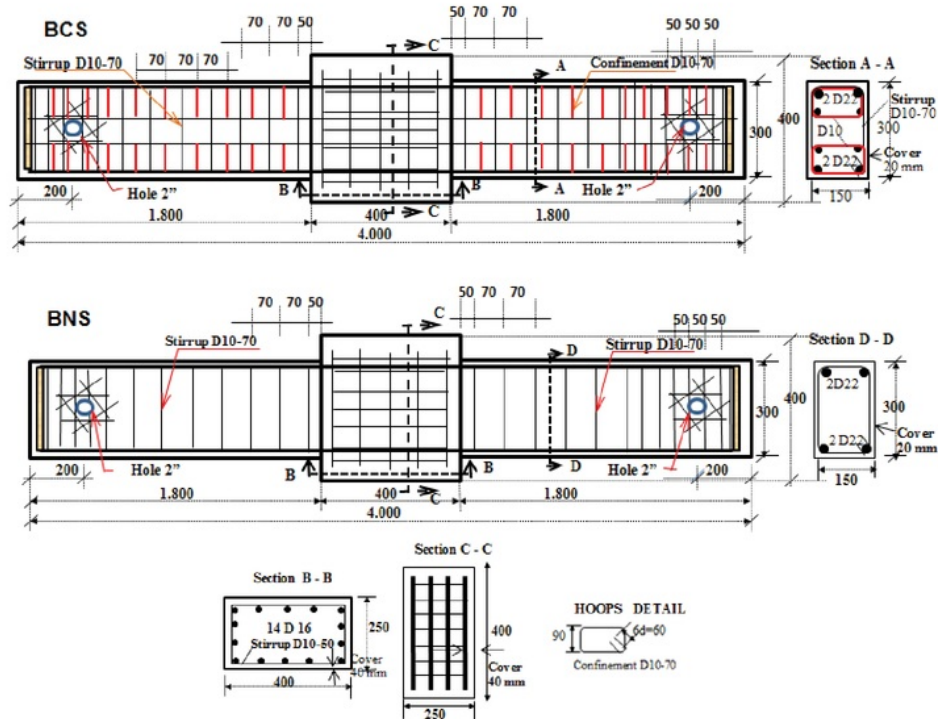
Details of specimen reinforcement at BCS and BNS
